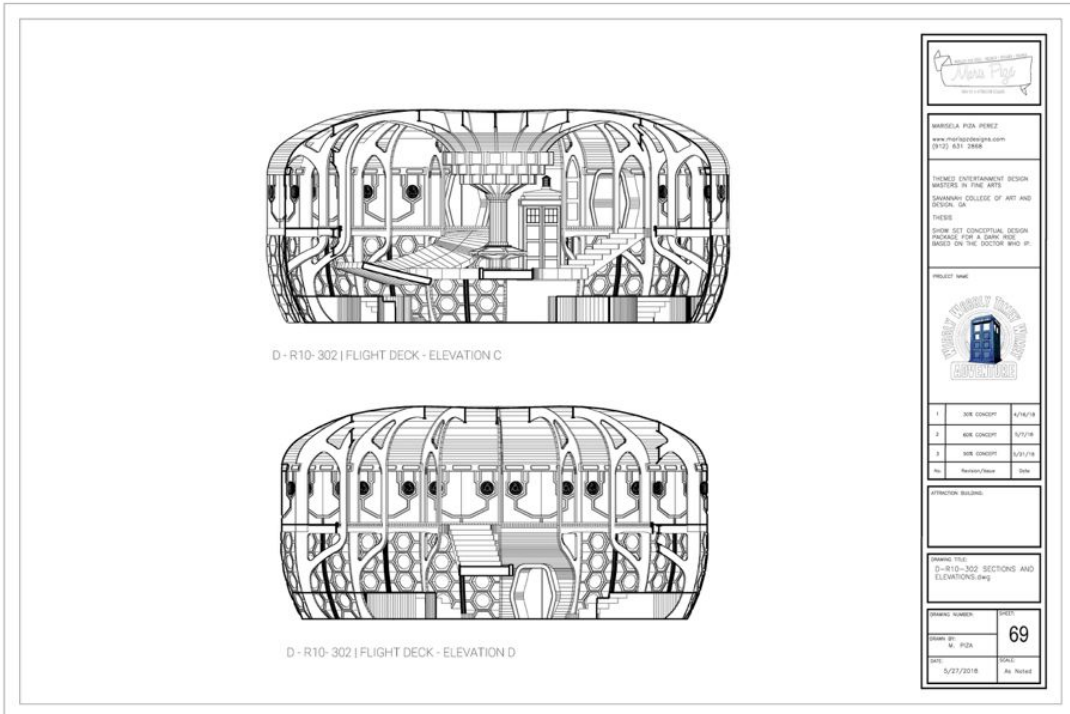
D-R10-302 | Unload - TARDIS Console - Sections and Elevations
